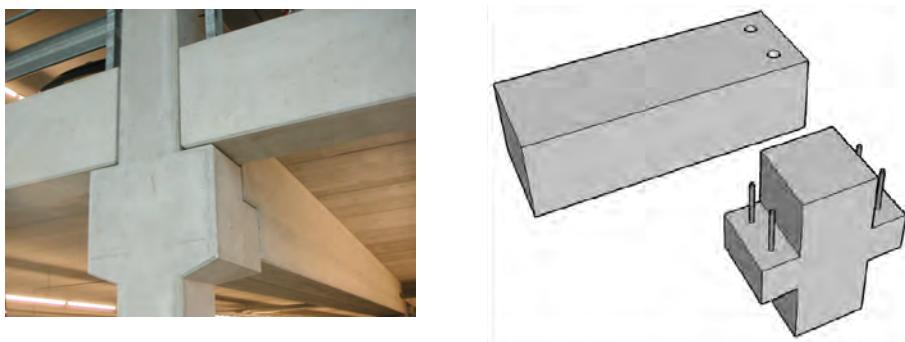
Beam-to-column connections using dowels in concrete corbels
